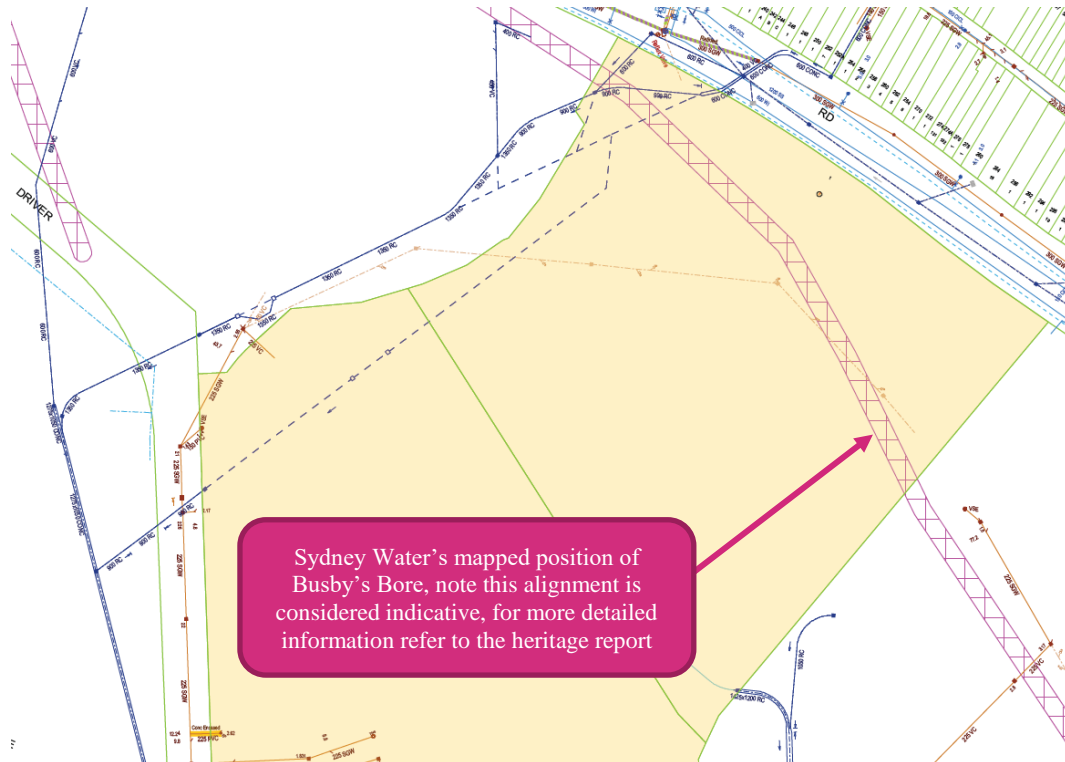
shows a number of pipes enter the site along its northern edge, near the intersection of Moore Park Road and Oatley Road, crossing the site to Driver Avenue:
